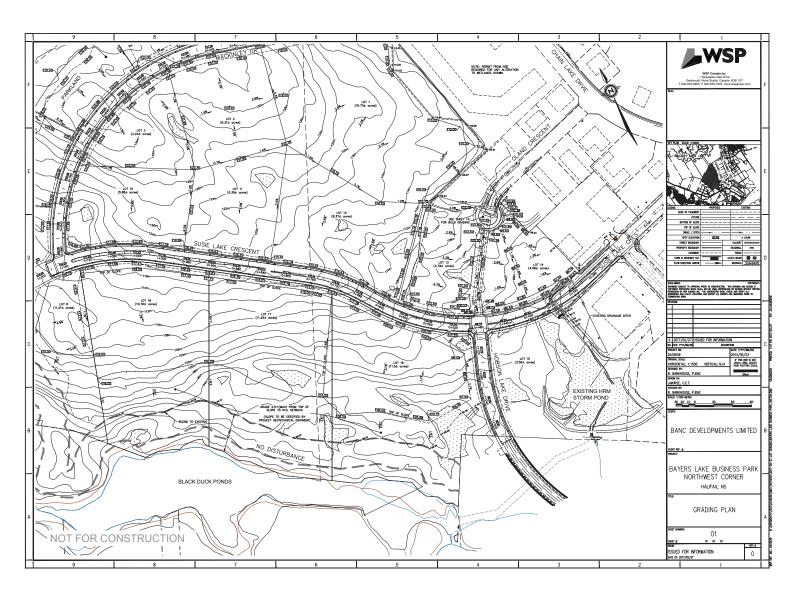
Bayers Lake Aerial View Fig. 667 Grading Plan
